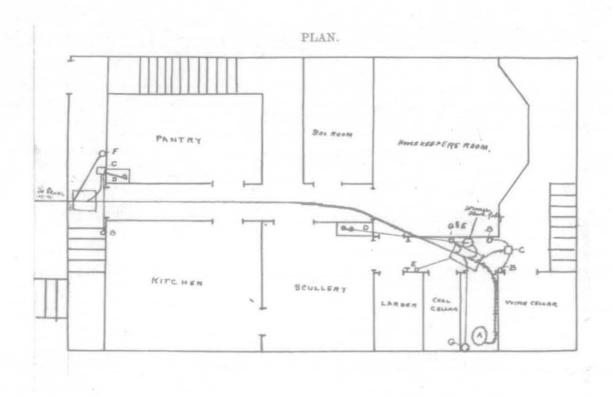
Schematic plan of basement in 1895 (Drainage Plan, RBKC)
